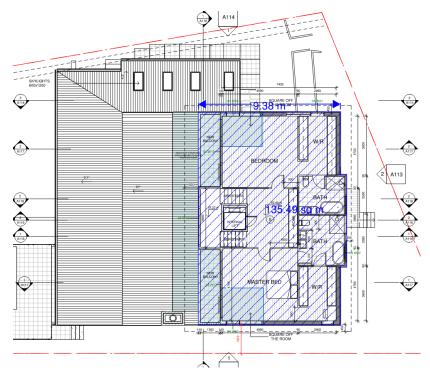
proposed floorplate of the upper building level; the floor plate is 9.4m deep and approx. $135.5m^2$ in area
